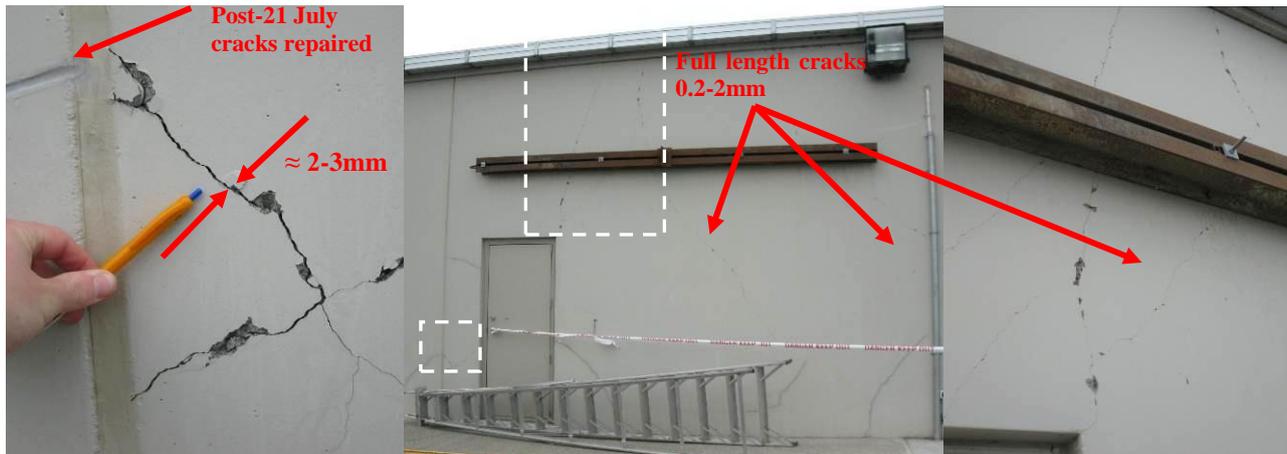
Precast concrete wall panels damaged following the 16 August earthquake. The panels had previously been repaired by epoxy injection of cracks following the 21 July earthquake.
